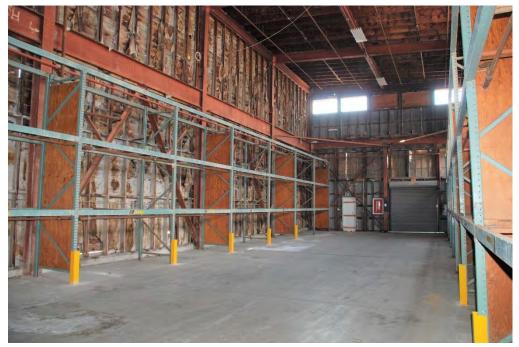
West warehouse building, view southeast across rear warehouse portion.
